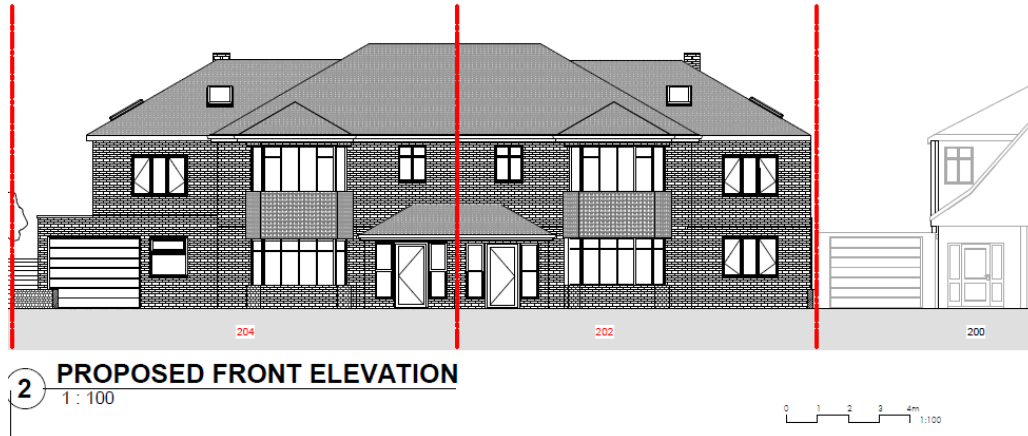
Proposed Front Elevation showing proposed and permitted extensions
